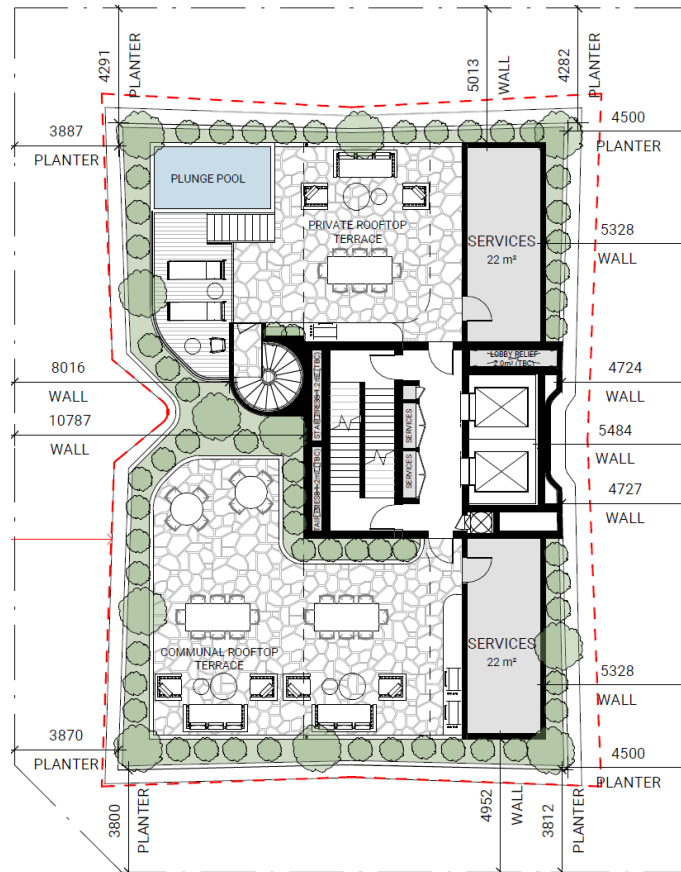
Proposed Roof Terrace Floor Plan (Source: Plus Architecture)
